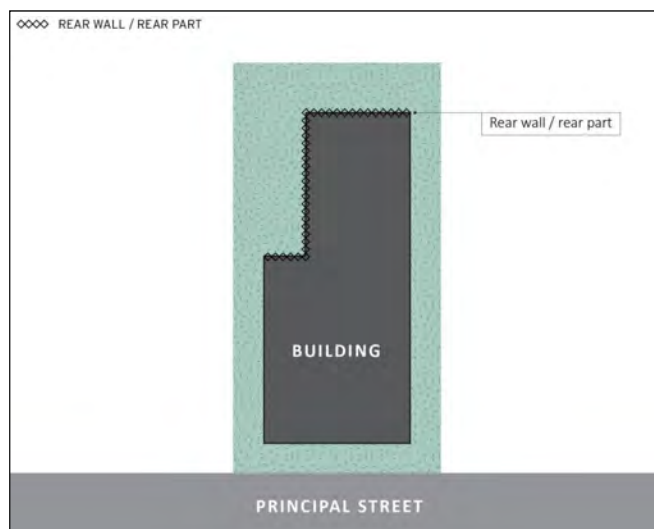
Modifications and alterations, including demolition, are exempt to the rear wall/rear part of building
